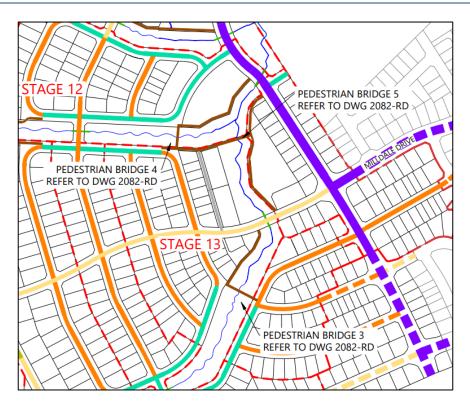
Bridge 3-5 connections. Source: Appendix 2K Part 4.
